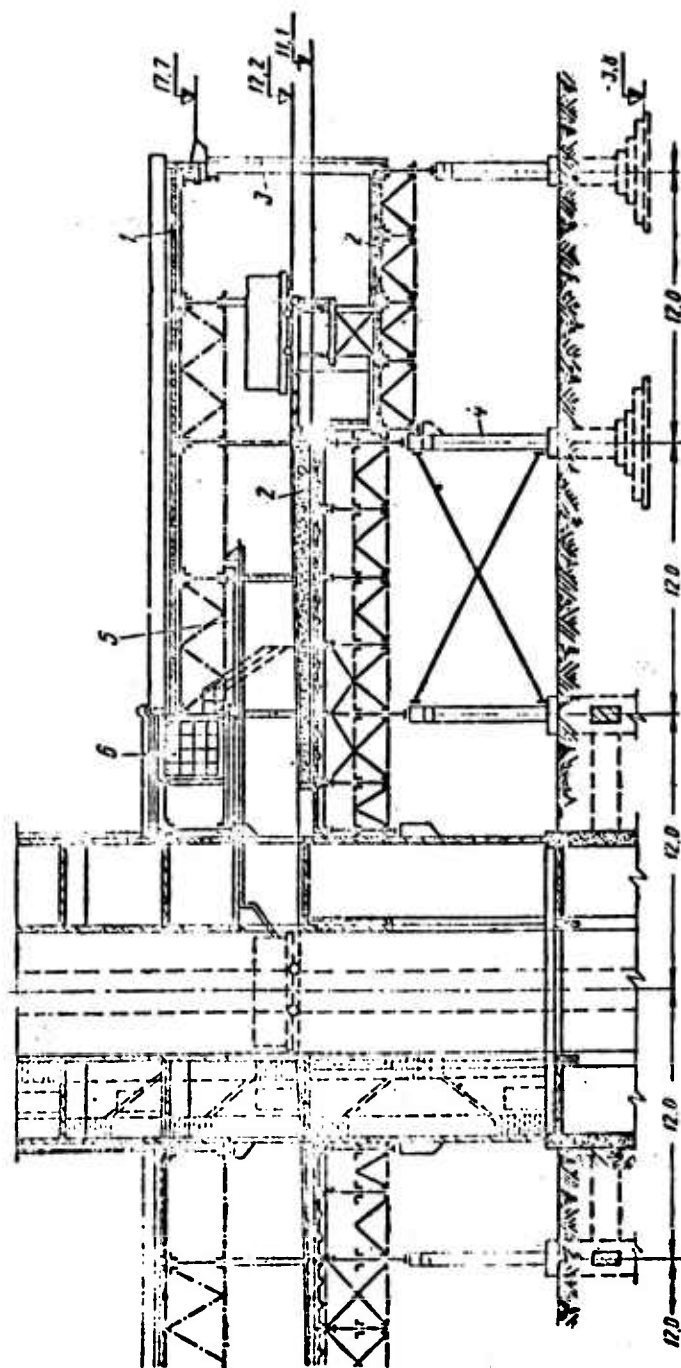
The haulage gallery of a capital ore mine shaft on junction plates with a deckhouse building, a longitudinal section: 1 - sectional large-size capping slabs; 2 - sectional flooring slabs; 3 - sectional wall panels; 4 - sectional ferroconcrete uprights; 5 - pushers; 6 - control station.
